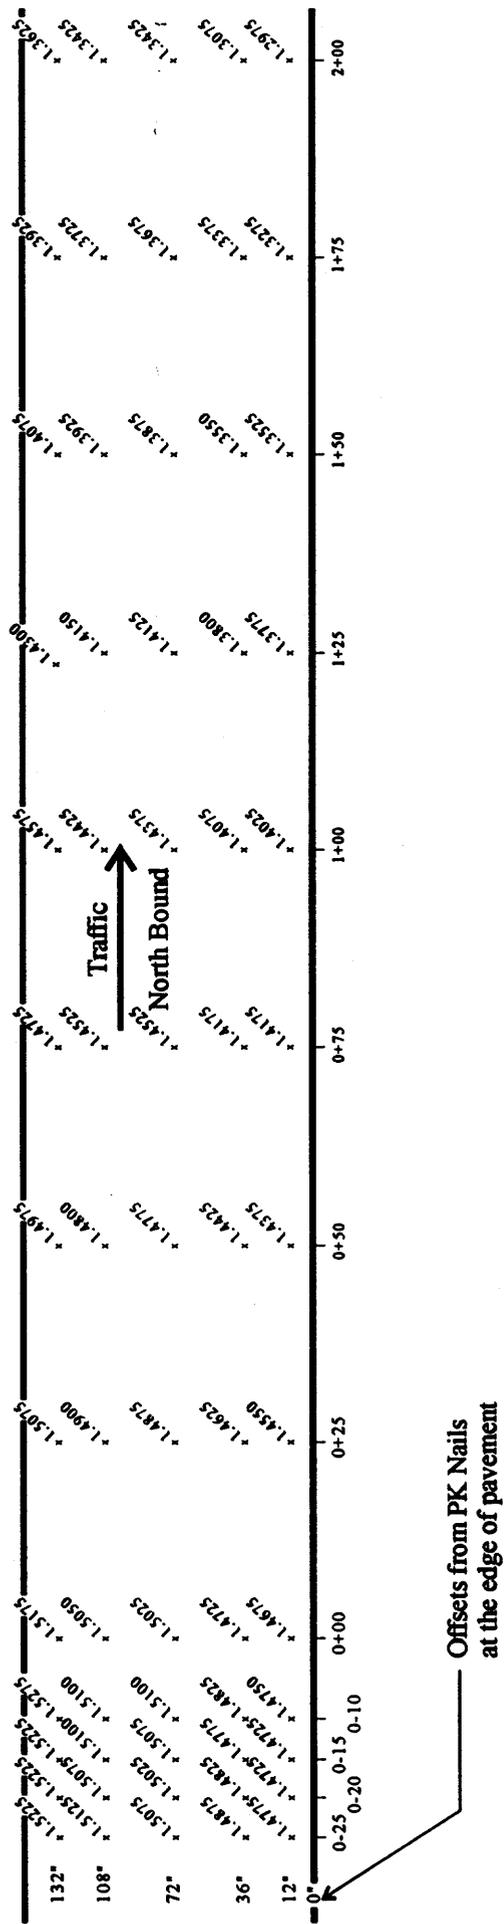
shows the locations of the installed instrumentation at the site. The instrumentation hole is at station 0-15 and the piezometer is at station 1+00. Figure 2 gives the plan view of the portion of test section 501002 that was used for elevation measurements. All offsets are from the PK nails found at the outside pavement edge.
